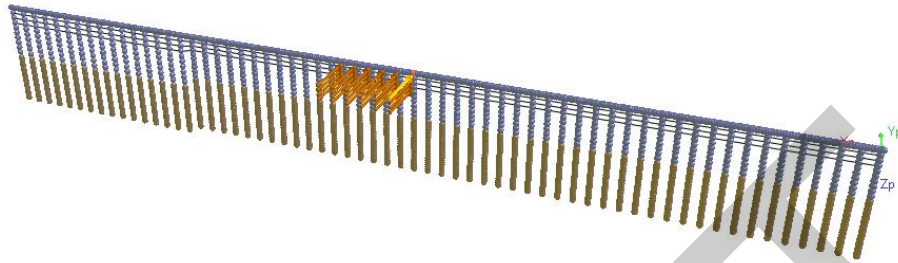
Layout – Load Case 5 (Section 4 – Soil C4)
